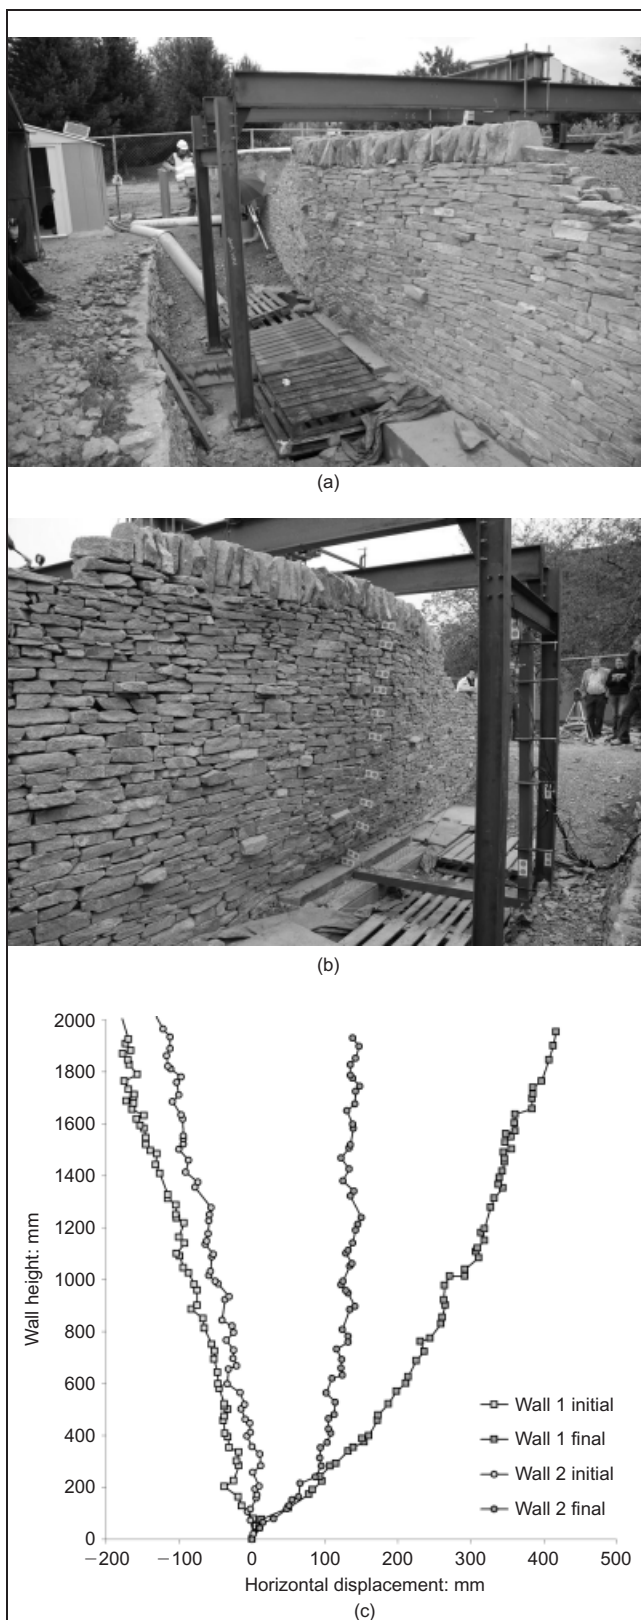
Physical test results: (a) wall 1 prior to failure; (b) wall 2 prior to failure; (c) graph of wall displacements
